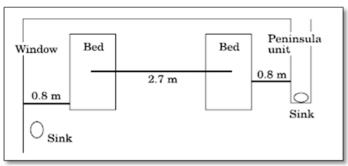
Typical Bed Arrangement Source: (Wilson and Ridgway, 2006)
